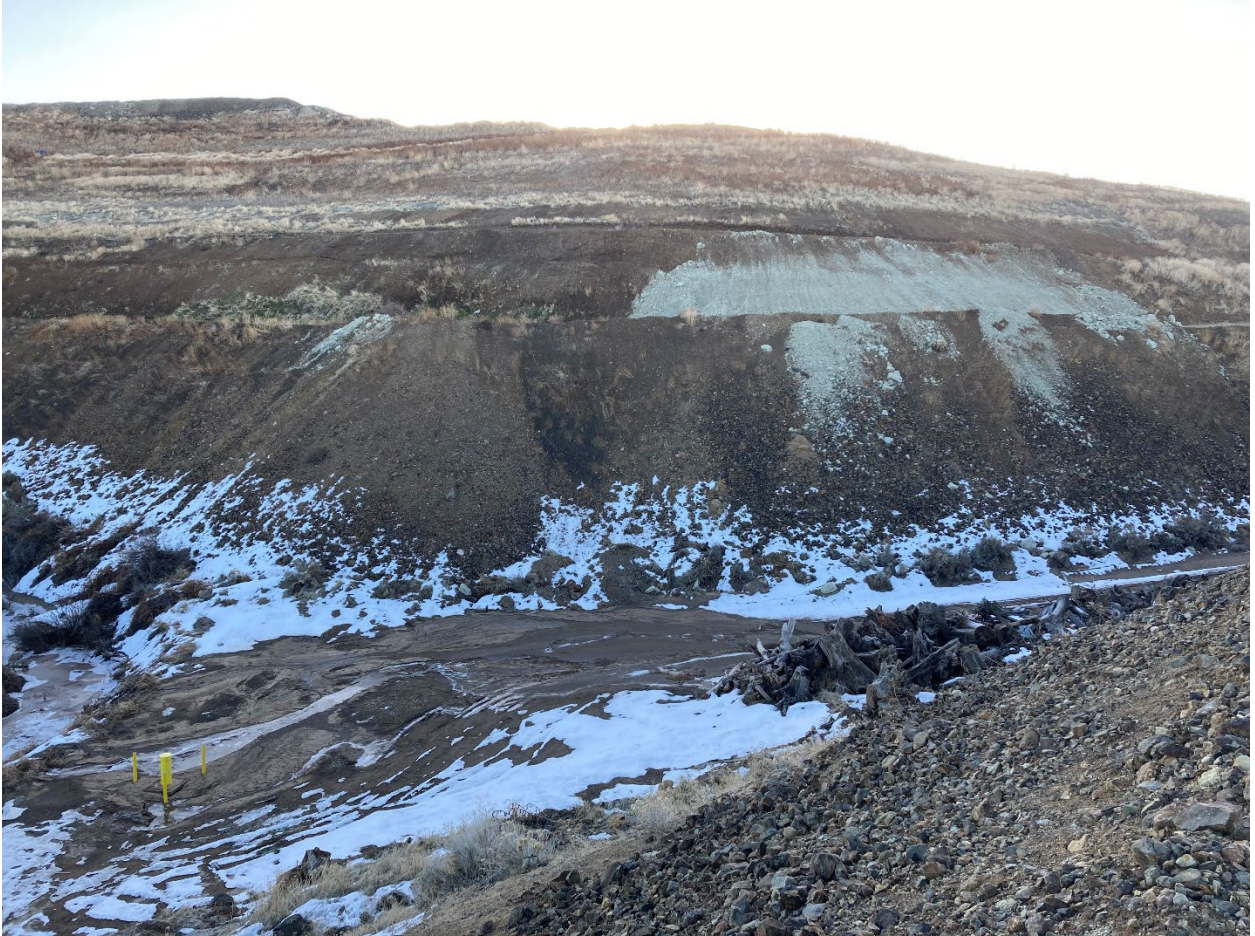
Photograph from same vantage point as Figures 1 and 2 facing southeast. Note light gray soil that has been placed over previously documented hot-spot above perimeter landfill road and green vegetation to the left.
